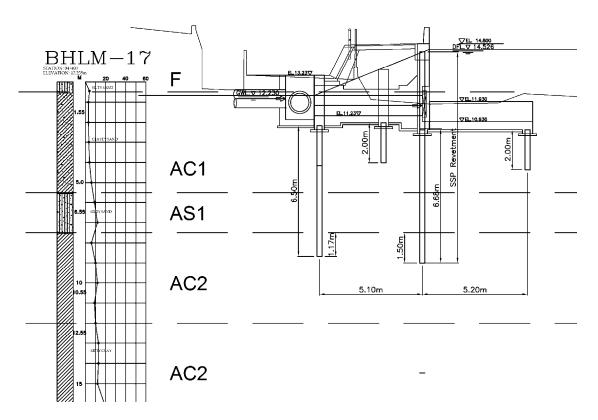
Length of SSP Cut off Wall (5/9) (MSL-5)
